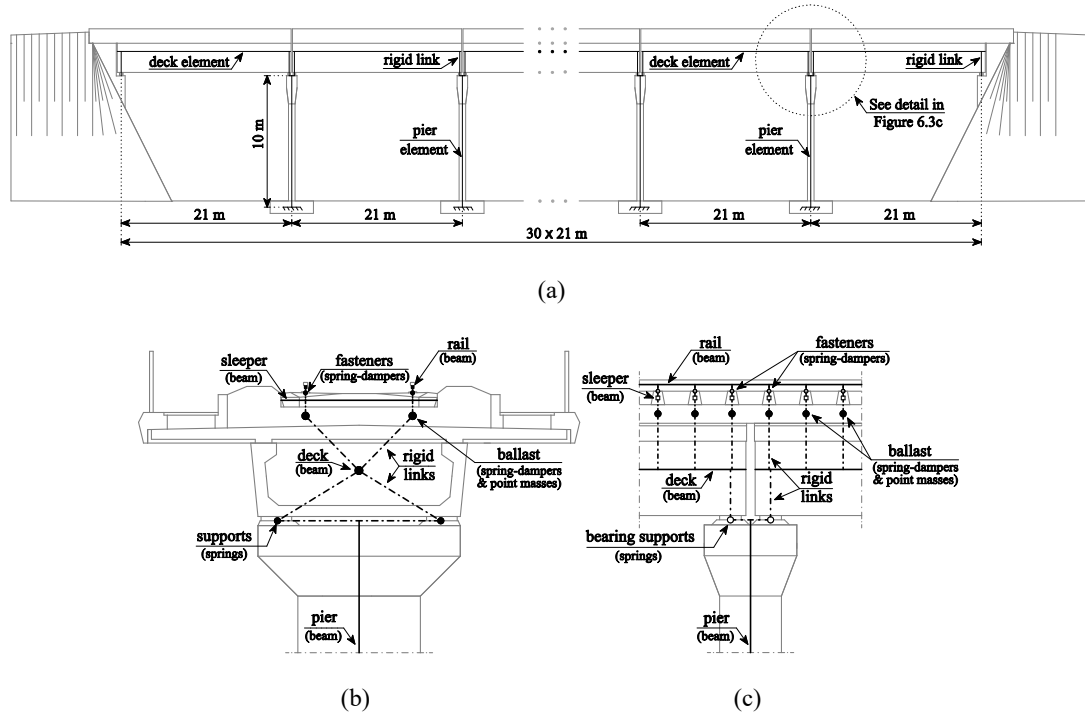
Numerical model of the viaduct: (a) elevation view, (b) cross-section and (c) deck joint
